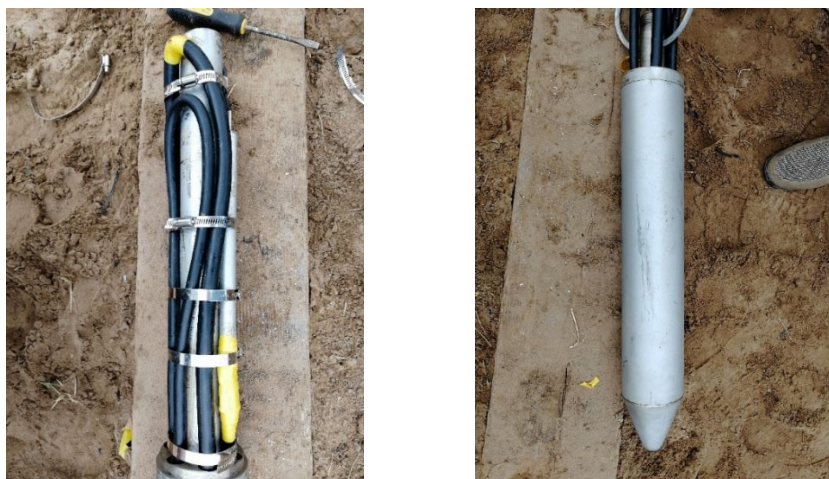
Guide head assembling and optical cable welding
